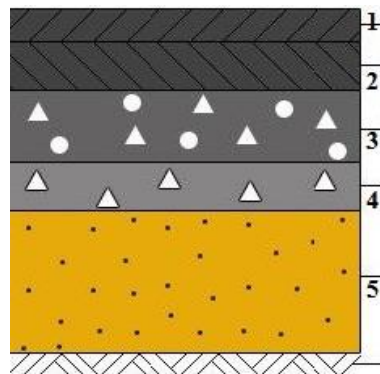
Constructive layers of roadways [13]: 1 – top layer of asphalt; 2 – base or bottom layer of asphalt; 3 – rolling concrete; 4 – crushed stone; 5 – sand
